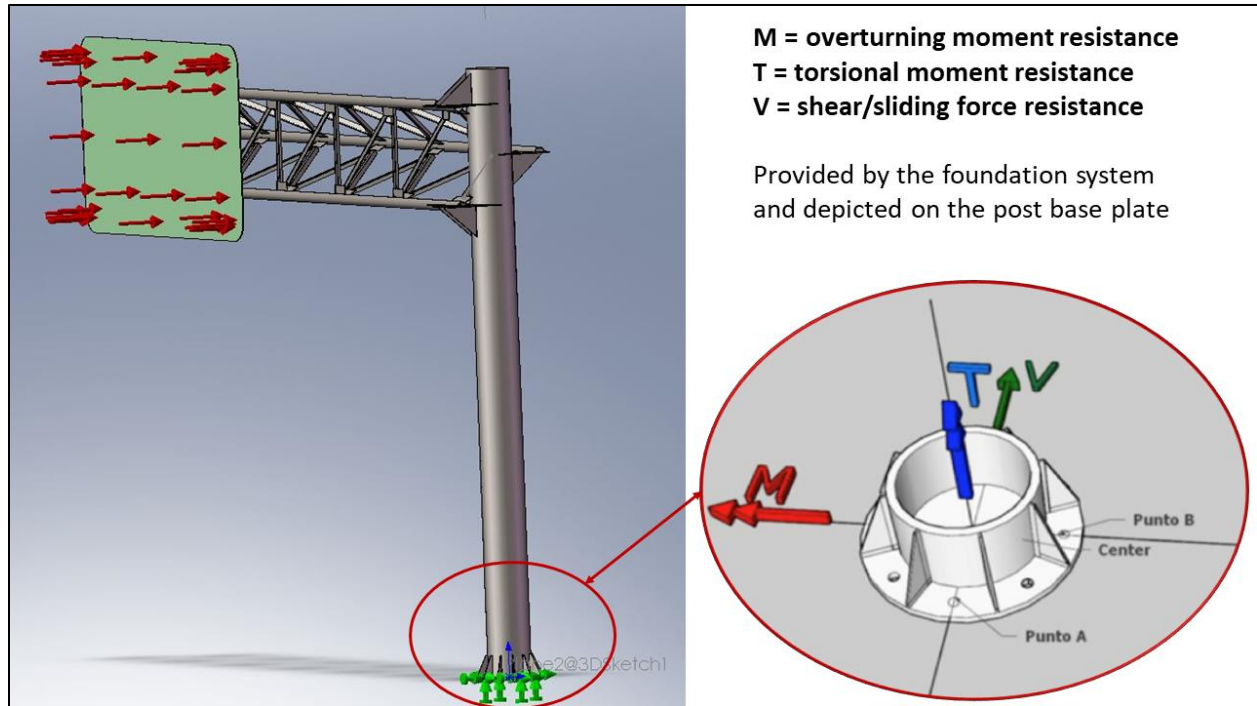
Required Foundation Resistance to Provide Stability to the Sign Structure
